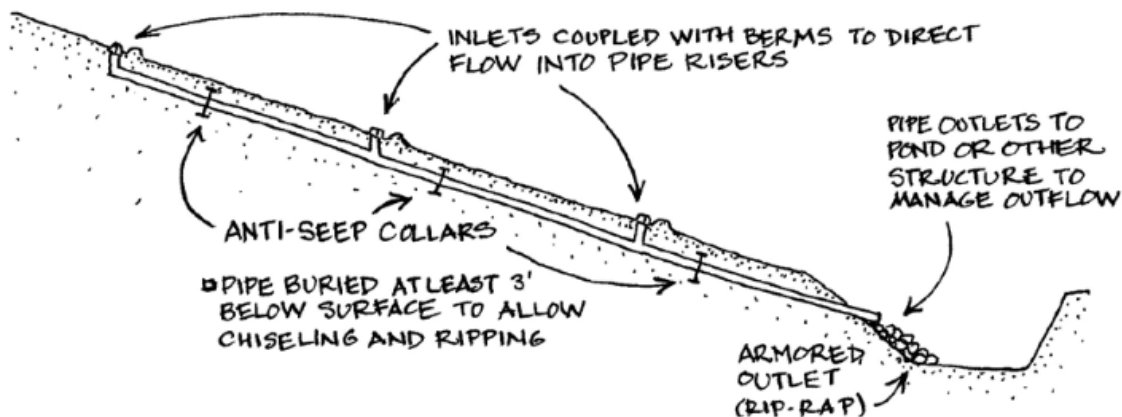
Underground outlets can transport water via pipes directly to an outlet or other diversion or infiltration structure. Underground outlets can be beneficial to take water away
